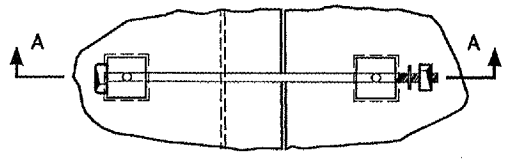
DETAIL OF PIPE UNDERDRAIN OUTLET INTO STORM SEWER OR PIPE CULVERT
